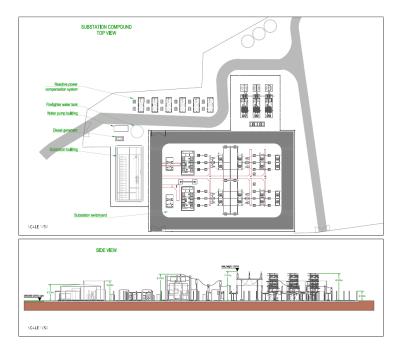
EXAMPLE LAYOUT AND CROSS SECTION OF THE PROJECT SUBSTATION
